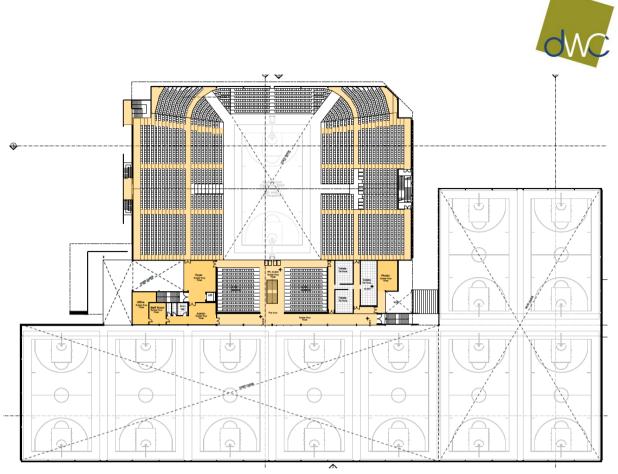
Mezzanine Plan (Source: BKA Architecture)
